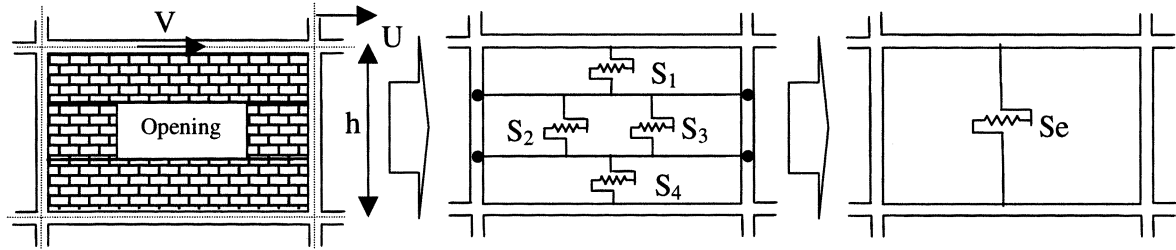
a. Infill masonry walls with one window-opening Type B.
